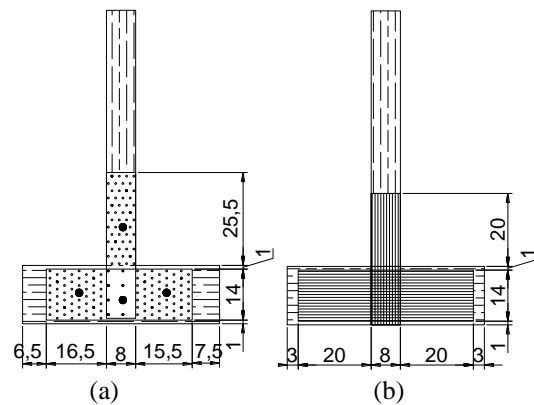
Retrofitting: (a) steel plates; (b) GFRP sheets
